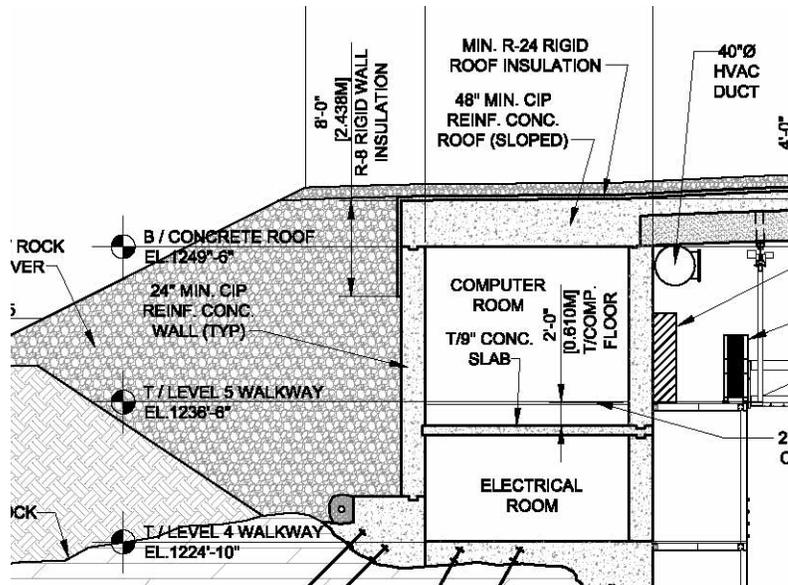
Section showing relation of Computer Room and Electrical Equipment Room to Detector Enclosure
